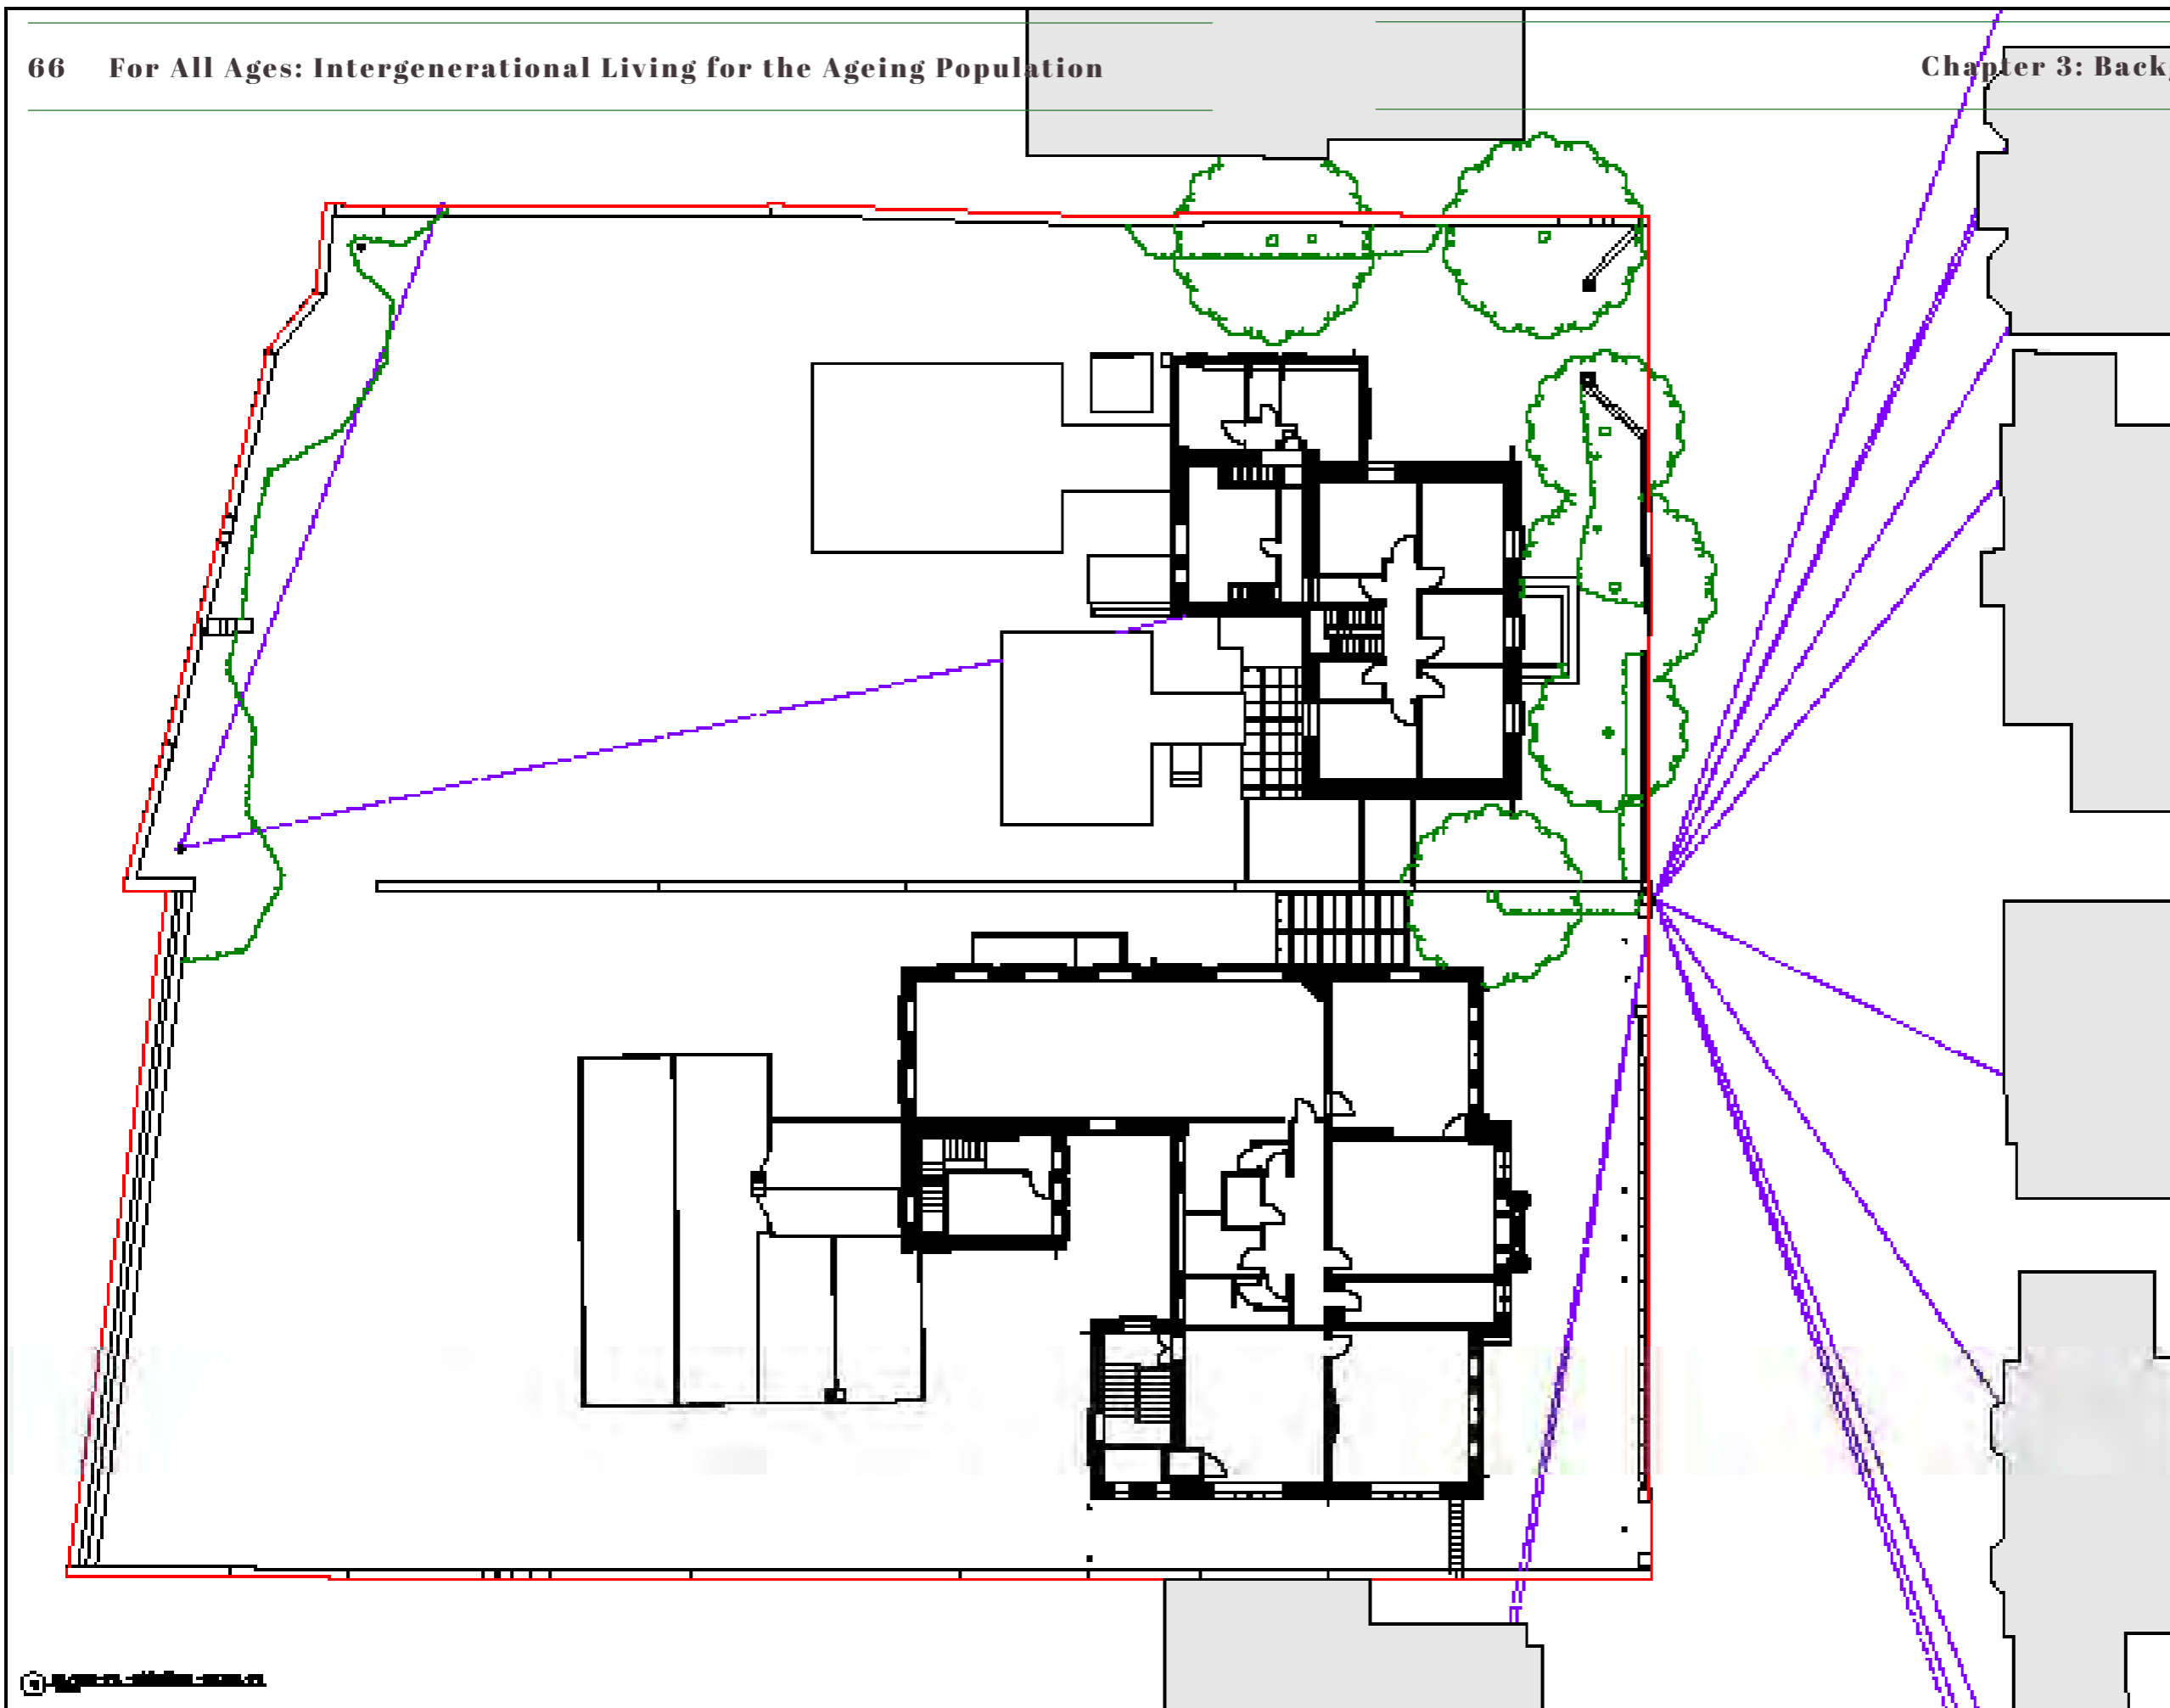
Author's Own. 2024. Empty Ground Floor Plan.
